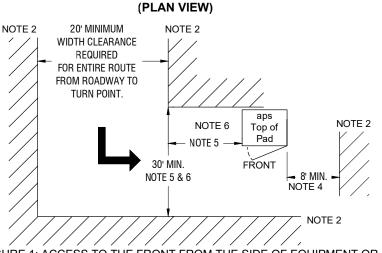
ACCESS TO THE FRONT FROM THE SIDE OF EQUIPMENT OR ACCESS DOOR
